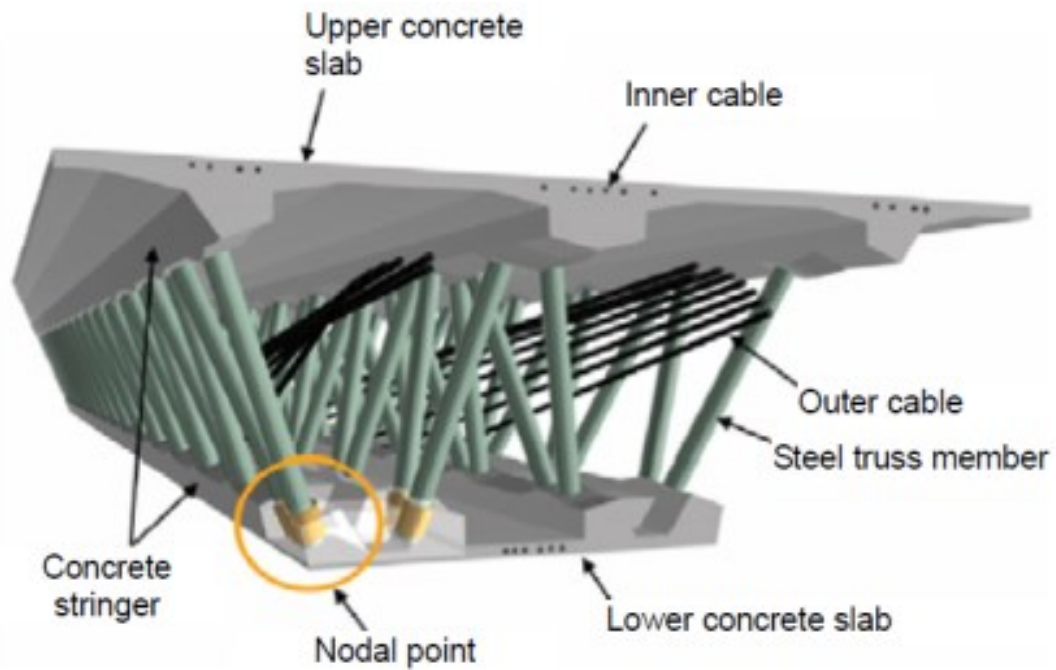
Composite construction with prestressing of upper and lower slabs [K. Ohgaki, 2011]
